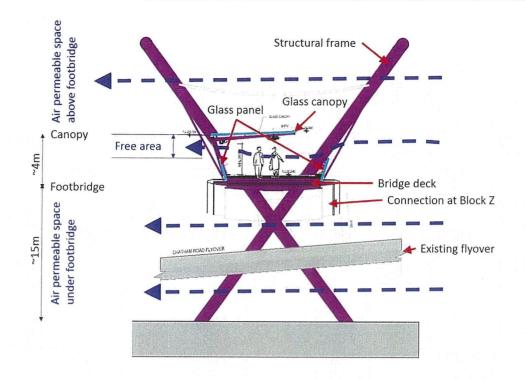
Easterly prevailing wind flowing through openings at footbridge (Section B)
